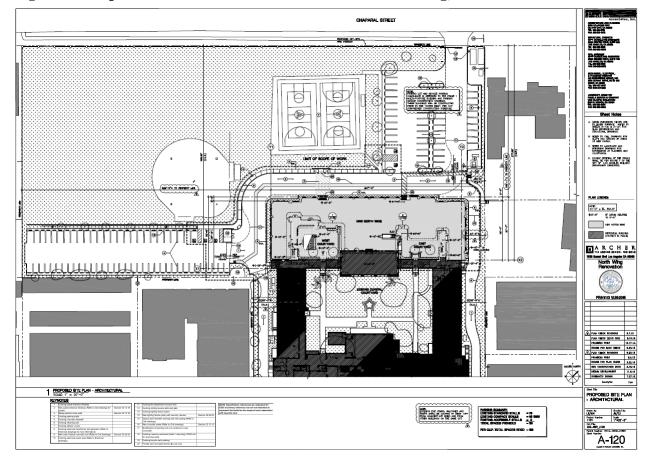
Site plan. Source: Parallax Architecture and Planning, 2015.
